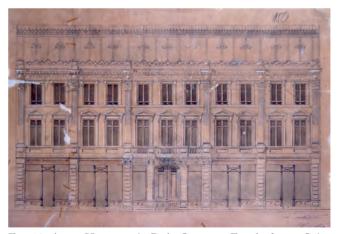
Assan House, arch. P. A. Gottreau. Façade facing Calea Mogoșoaiei. 66, Calea Mogoșoaiei (AN-DMB, PMB Collection, Technical Service, file 15/1873, f. 152).
